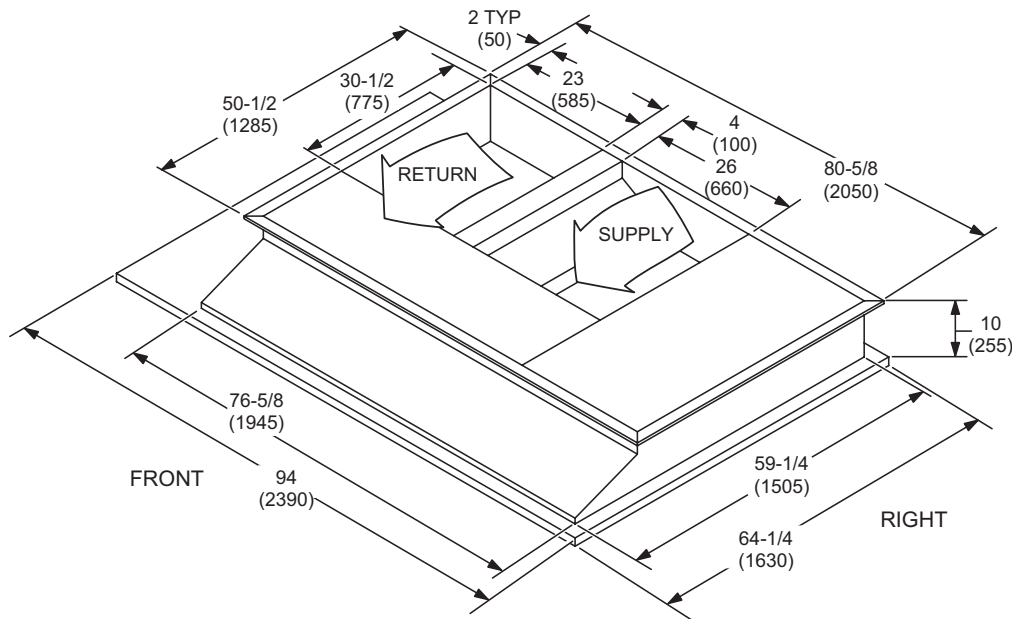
SUNLINE™ TO PREDATOR® TRANSITION ROOF CURB
